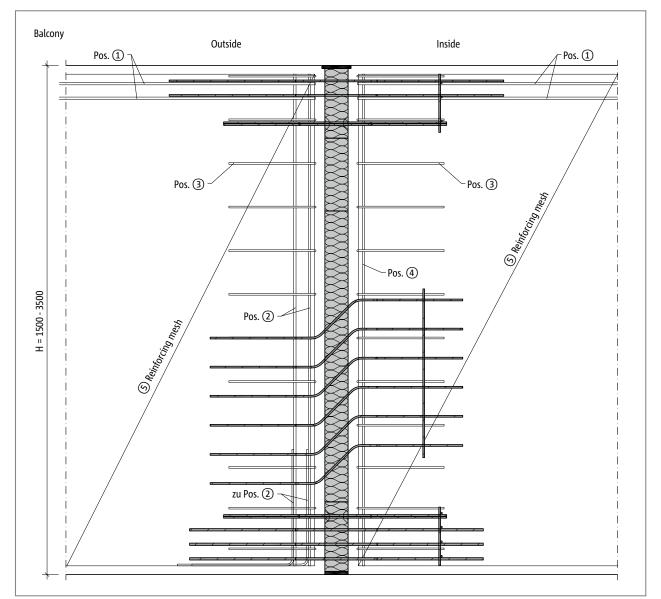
Schöck Isokorb® T type W: On-site reinforcement (cross-section)
